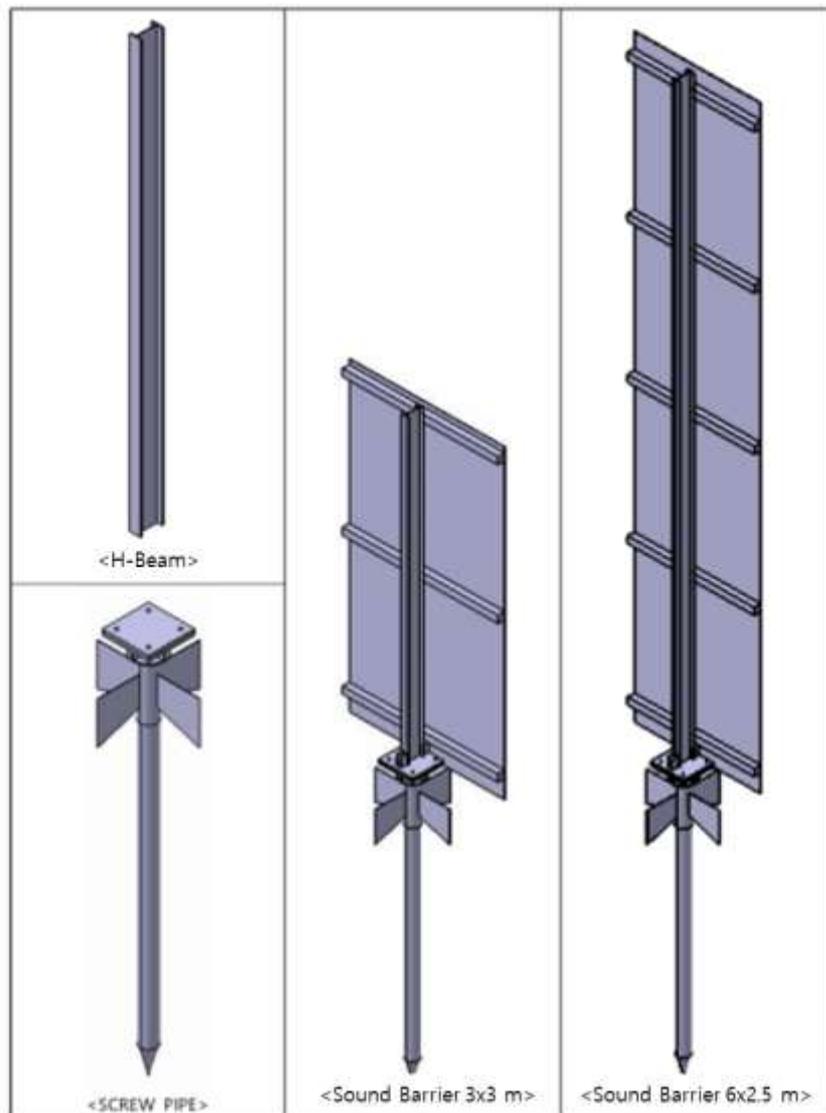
D modeling of H-beam steel, screw pile and sound barrier assembly
